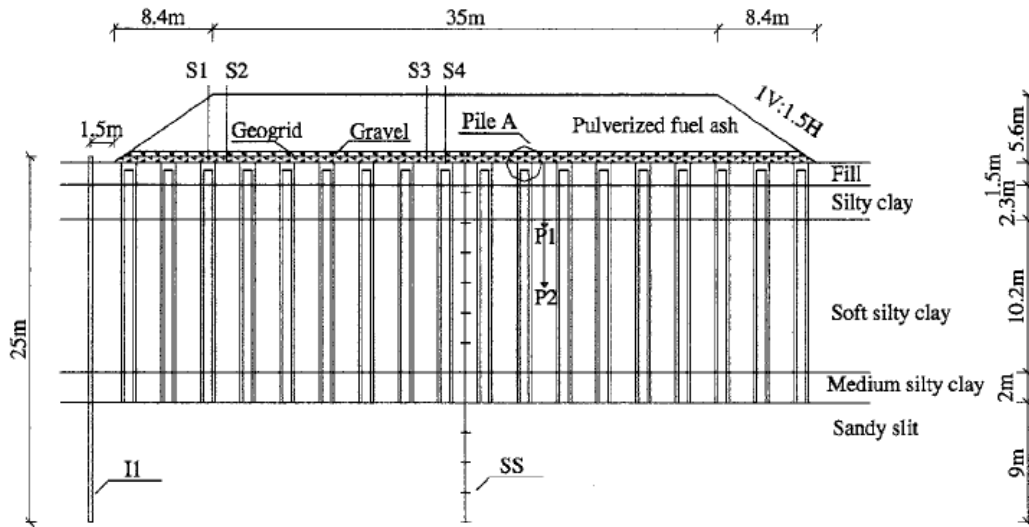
Cross Section of Embankment with Basal Geogrid and Columns
